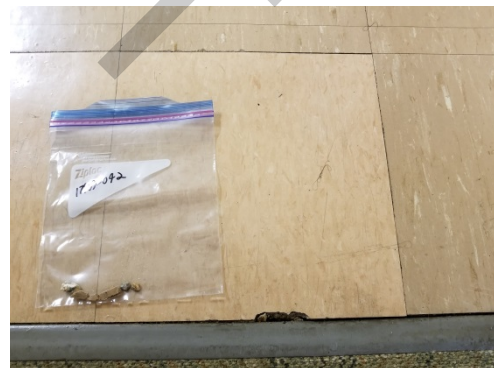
Off-white floor tiles in the stairway were ACM, and had a black mastic with trace amounts of asbestos. (May 22, 2018)
